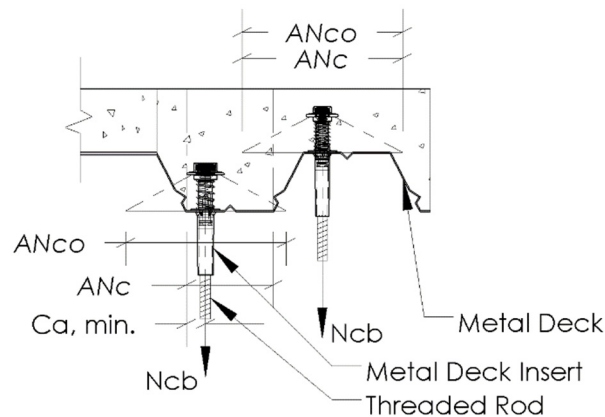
IDEALIZATION OF CONCRETE FILLED STEEL DECKS FOR DETERMINATION OF CONCRETE BREAKOUT STRENGTH IN ACCORDANCE WITH ACI 318
